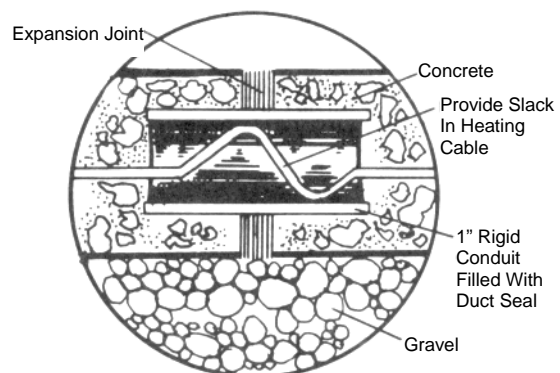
B METHOD OF CROSSING EXPANSION JOINT
